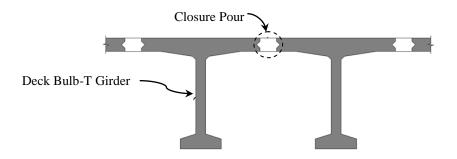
Example Closure Pour between Deck Bulb-T Girders
